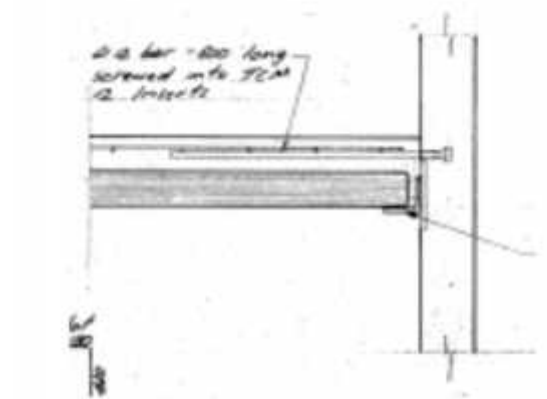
circa 1987 typical pre-cast concrete floor unit bearing and structural topping detail (original).
